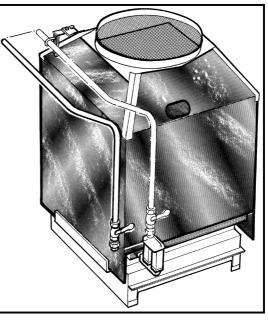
shows the pipe clamp fitted to Purewell 60, 70, 80 and 120 kW boilers.
